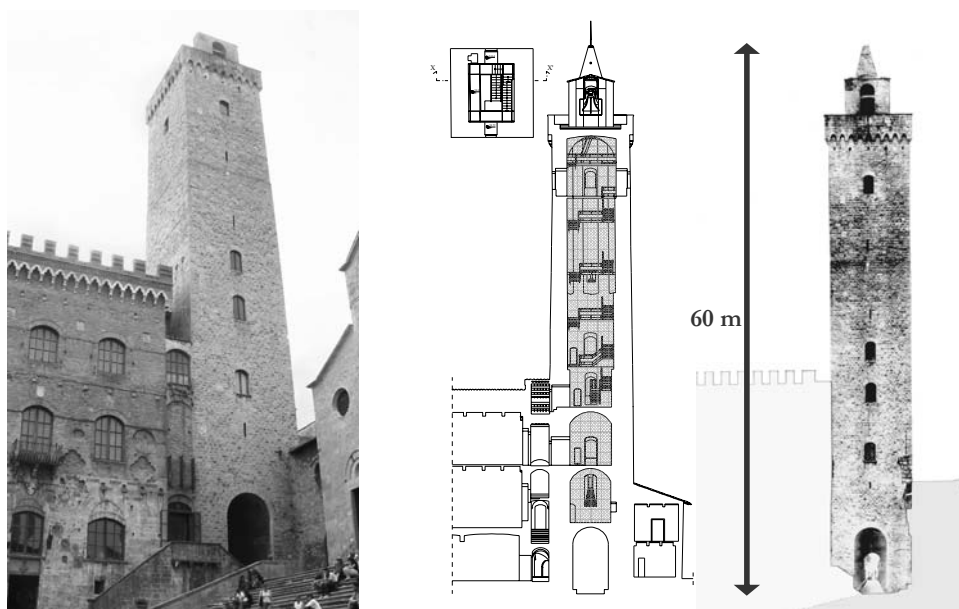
(a) View of the tower with the neighbour “*Palazzo Comunale*” and (b) Section of the tower.
